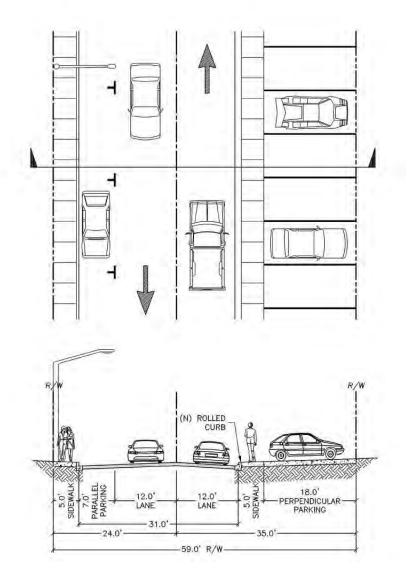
Potential 11th Street 59' Plan/Cross-Section
